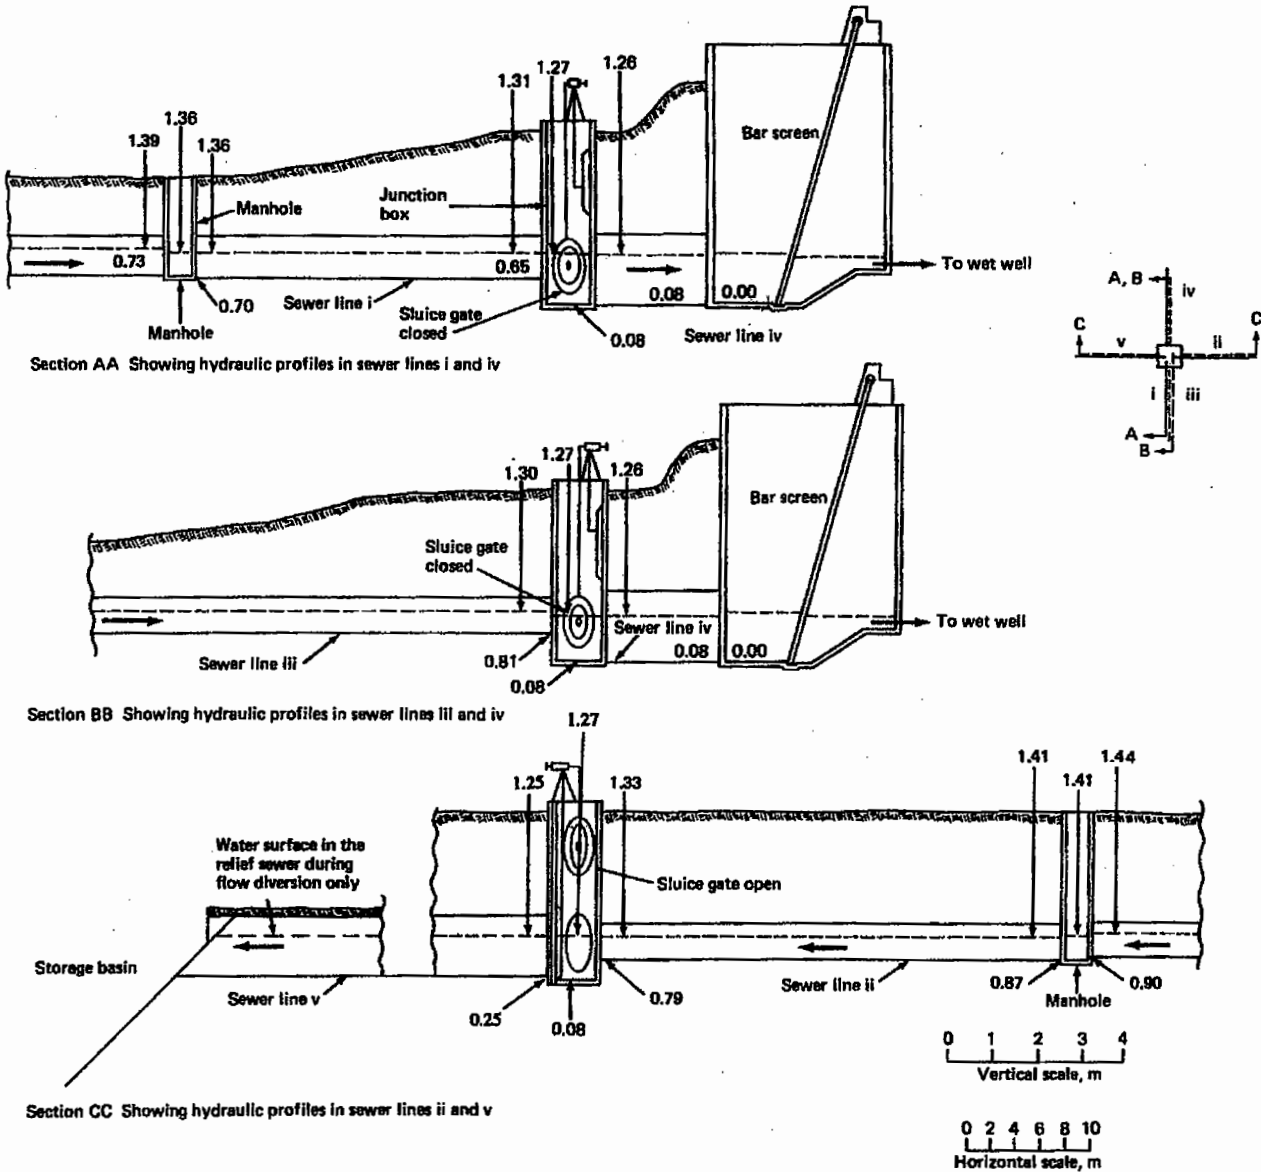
Sewer Profiles for the Design Example (see Tables 7-5 and 7-6 for sewer line identification number and details). All Elevations Are in Meters above the Floor of the Rack Chamber.
